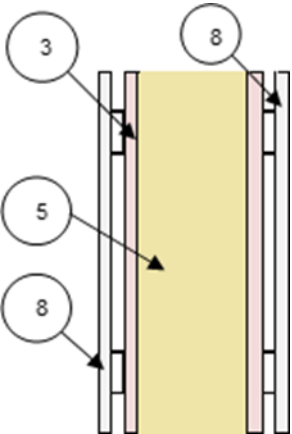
Massive timber panel with single skin incorporating non-fire grade lining – Section view
